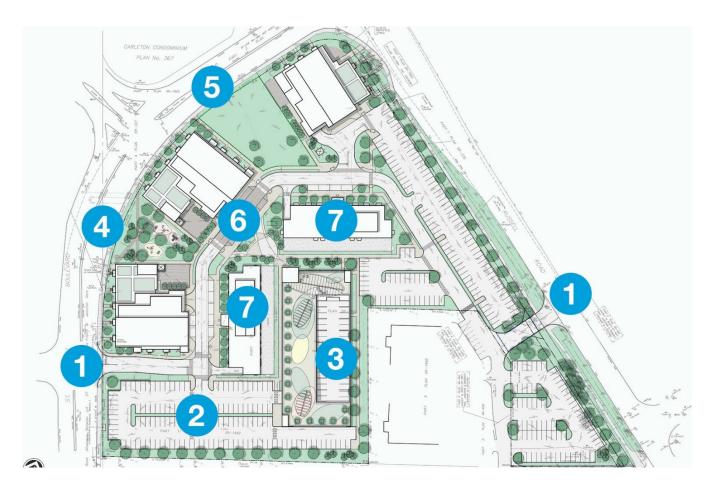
Key Elements of Proposed Site Layout (1 -Access Points; 2 -Surface Parking Area; 3 – 4-storey above-ground parking structure; 4 – At-grade landscaped private amenity space; 5 – Proposed Parkland dedication; 6 – Internal drive aisle with sidewalks; 7 – Existing 18-storey residential buildings.)
